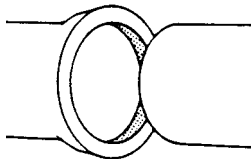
PUSH-ON-JOINT ASSEMBLY
